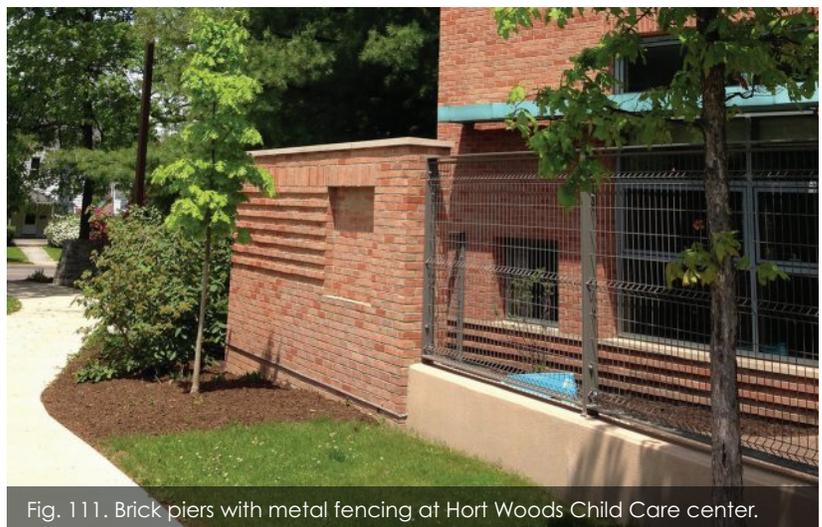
Brick piers with metal fencing at Hort Woods Child Care center.
